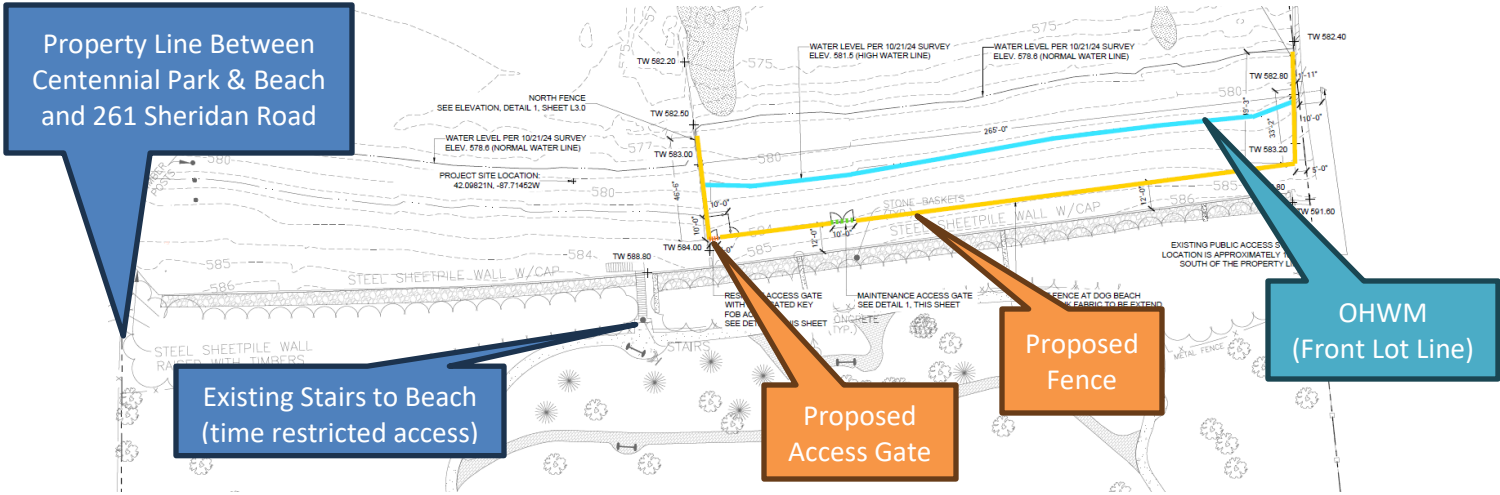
New Plan - Site Fencing Plan (Excerpt of Sheet L2.0)
